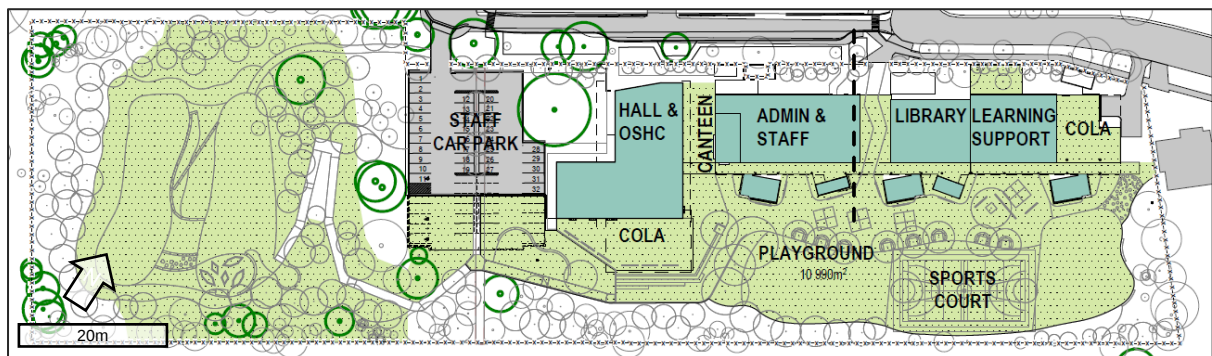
| Stage 1 site layout (Source: Applicant's RtS 2021)
